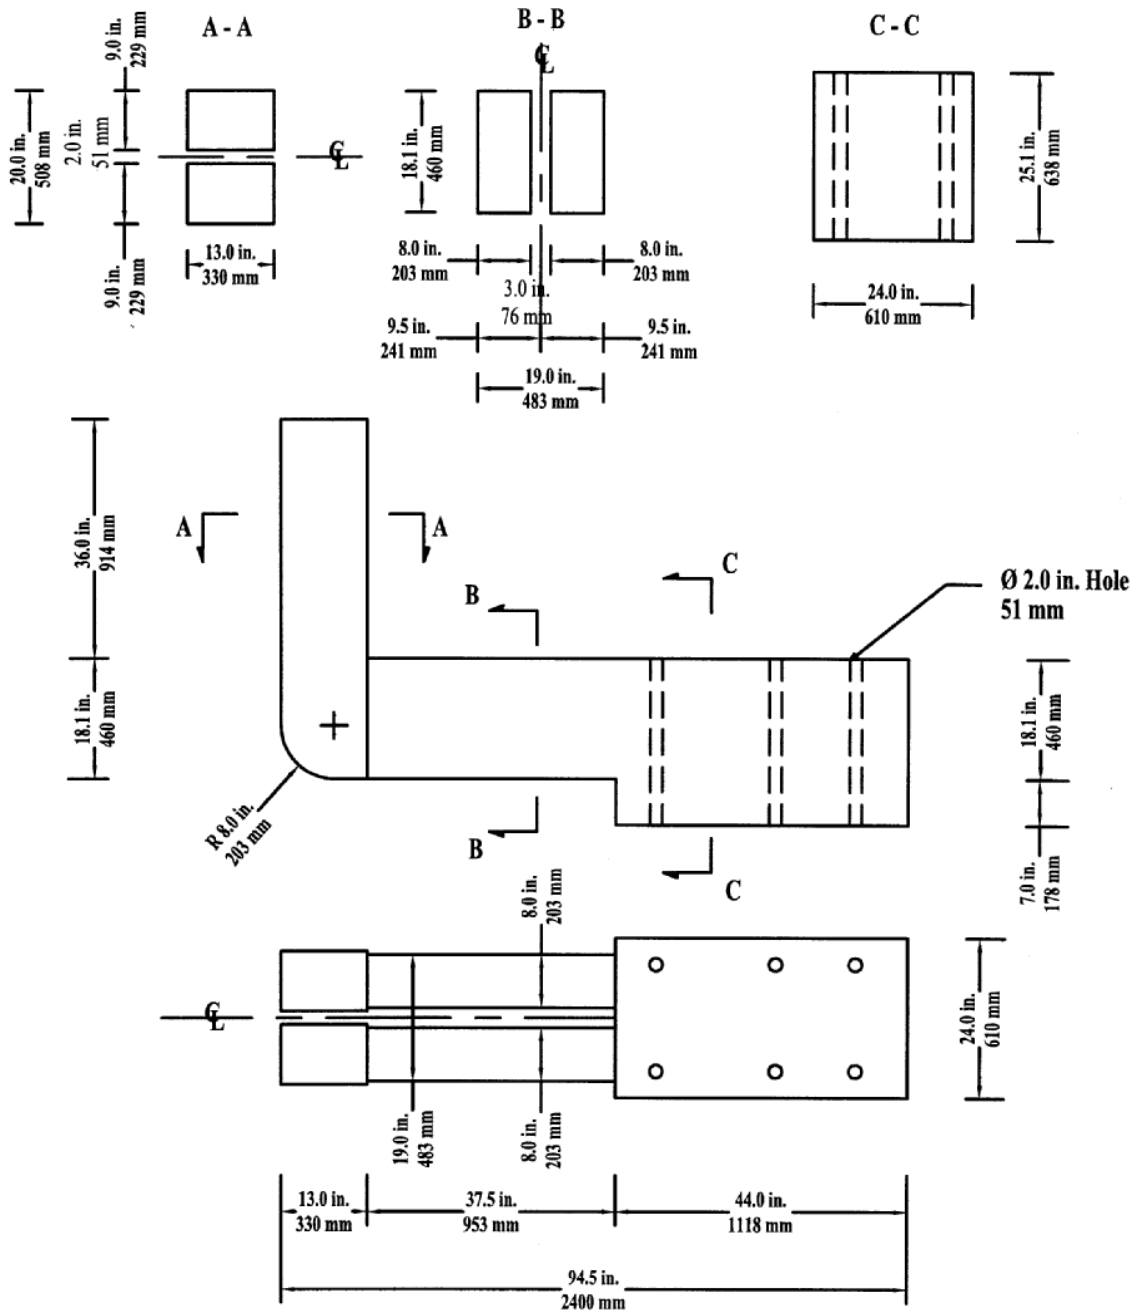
As-Built Split Long Outrigger Specimen Dimensions
